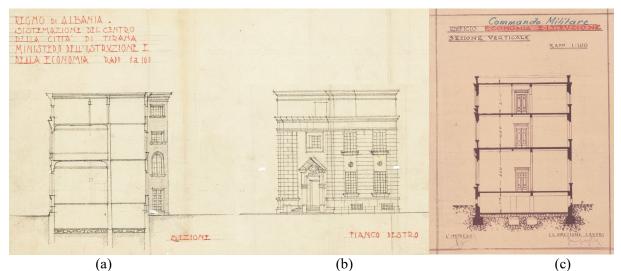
(a), (b) Section cut and the south façade behind, from the "F. De Fausto project idea 1929", (c) Section cut from the implementing project 1941 (Source: AQTN)
